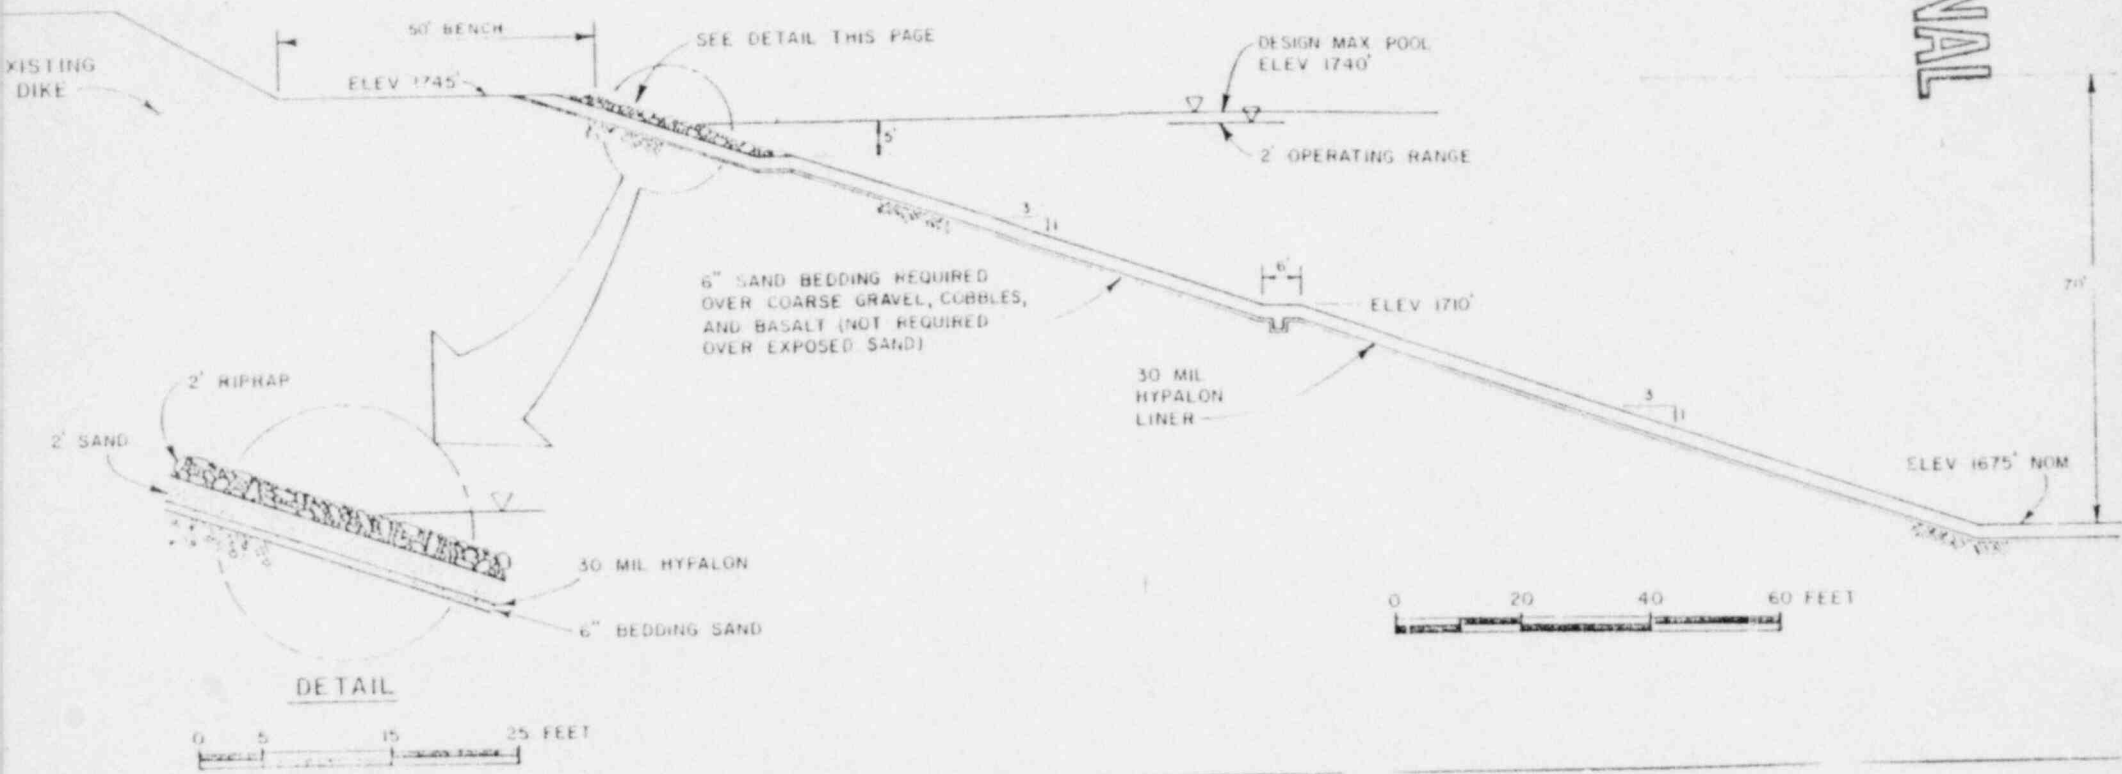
Typical Section of Pit (Source: Reference 2)
